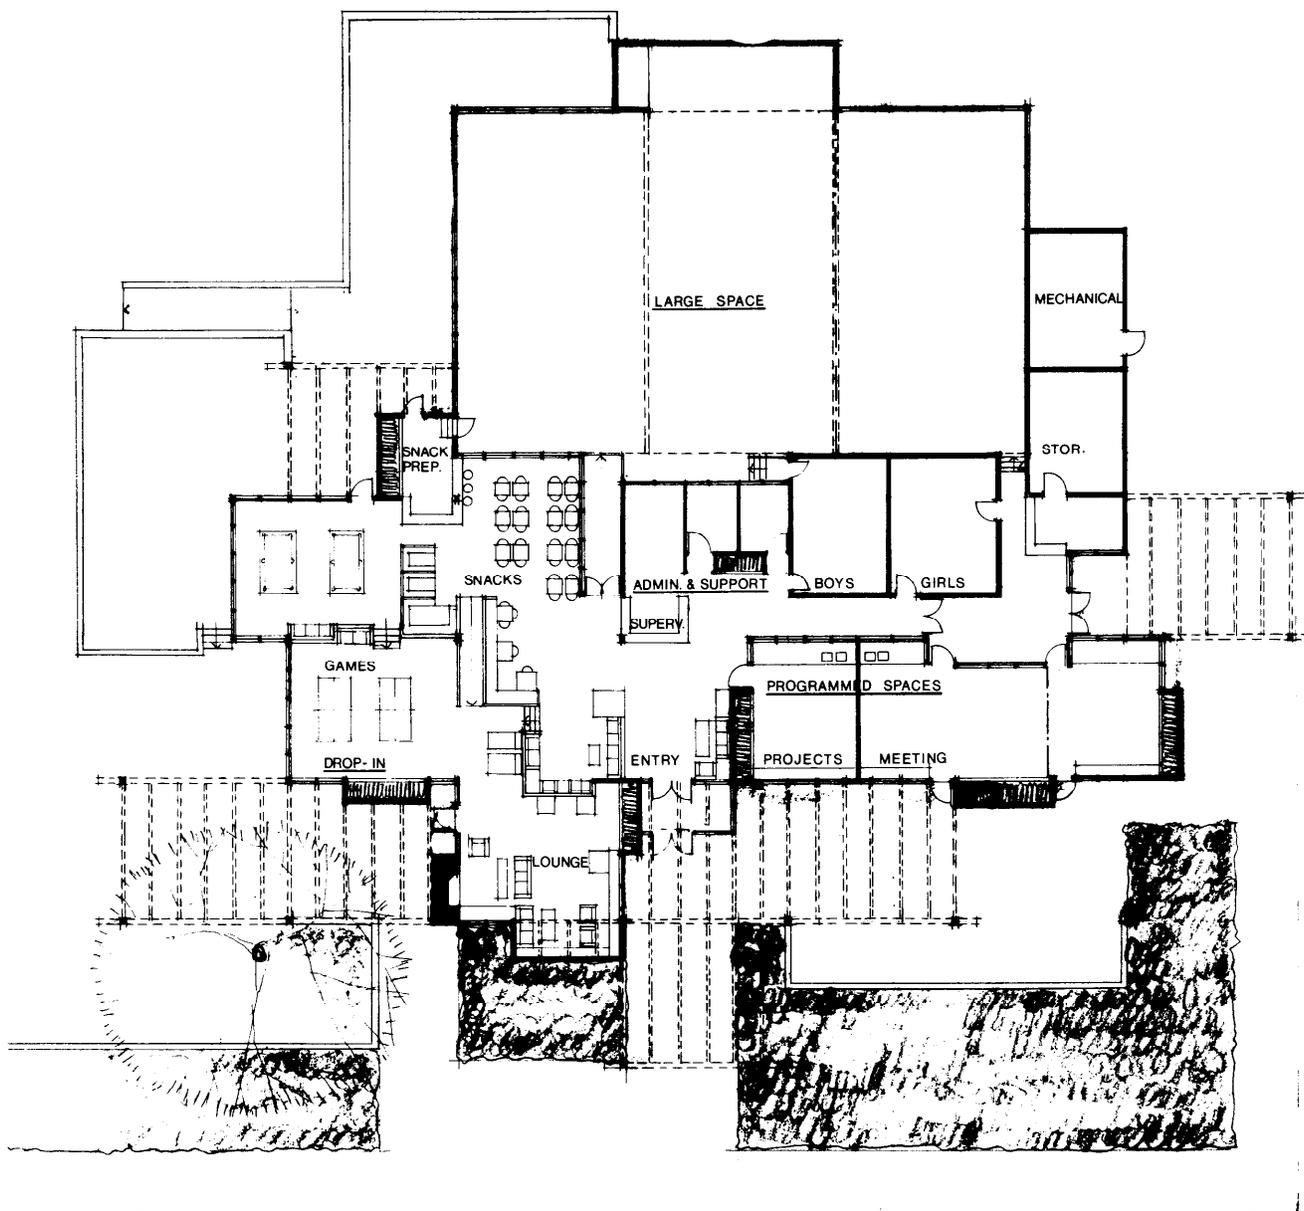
Medium-sized Main DYAC: Floor Plan
